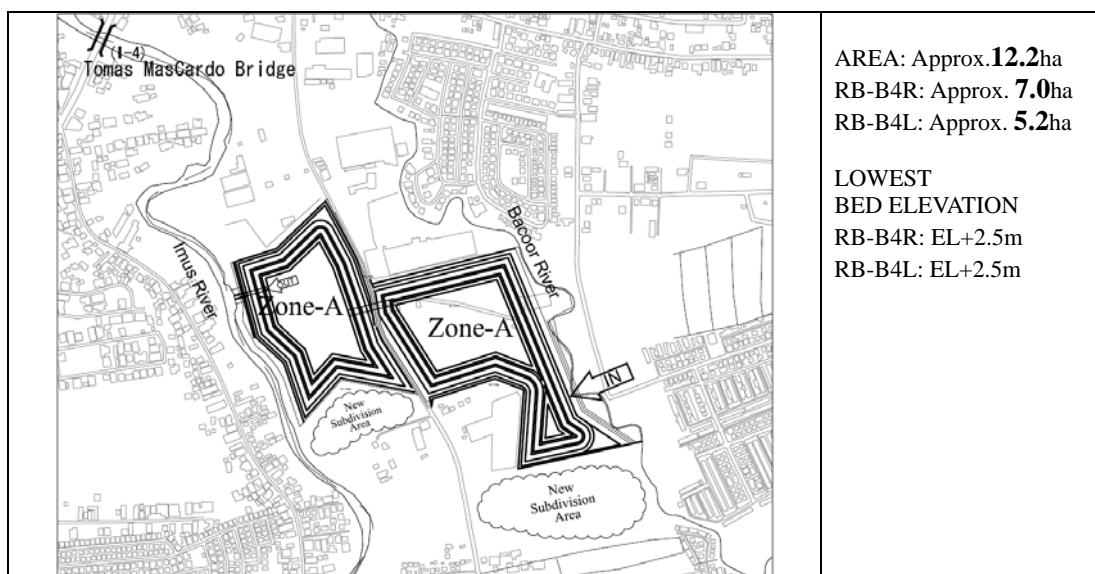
Plan of Bacoor Retarding Basin with Maximum Area (12.2ha)
